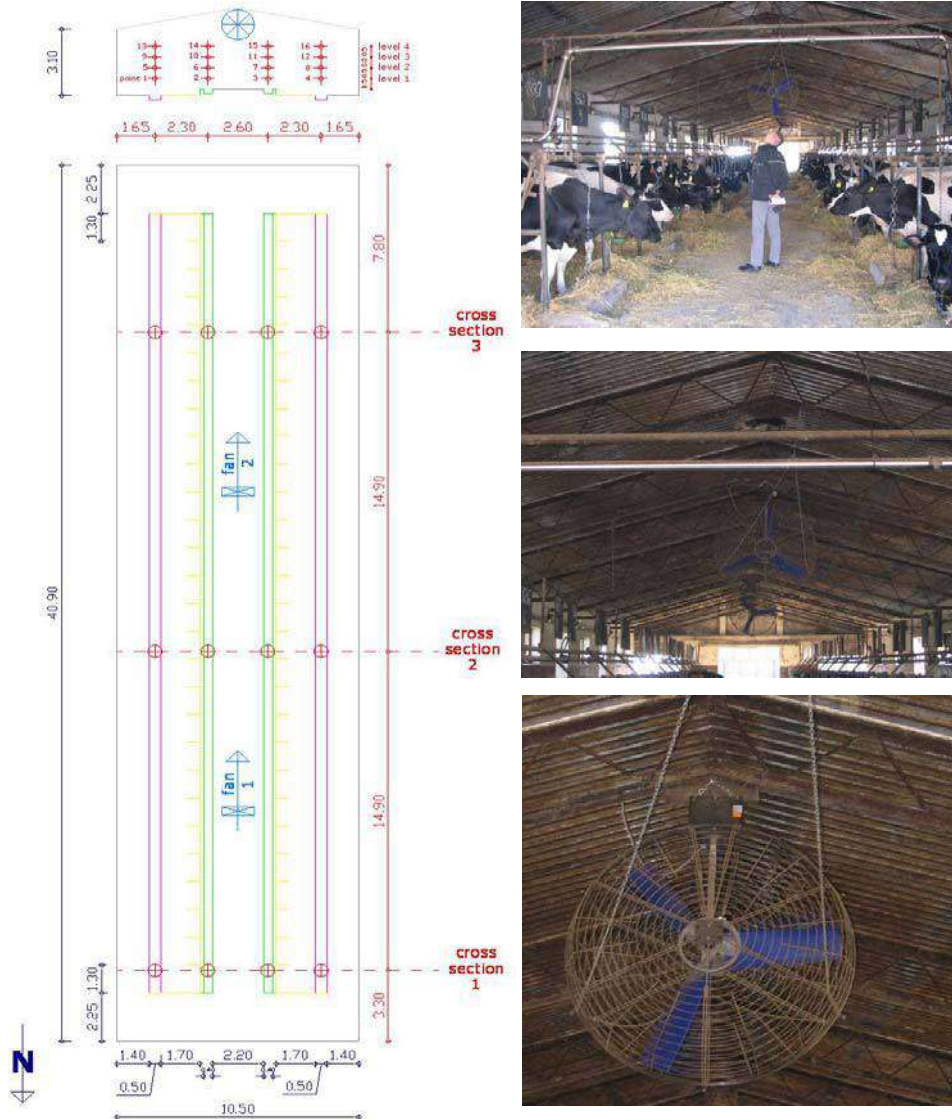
Building layout and measuring points setup (left) and photos of indoor ambient (right)
